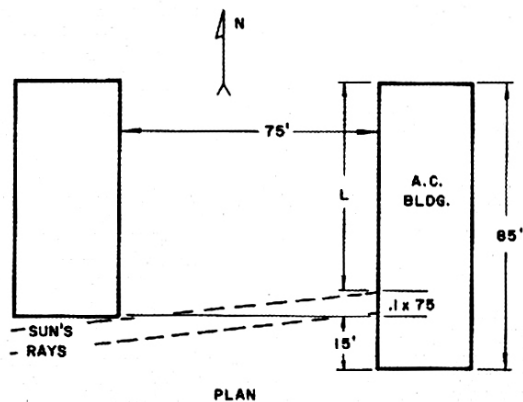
SHADING OF BUILDING BY ADJACENT BUILDING
